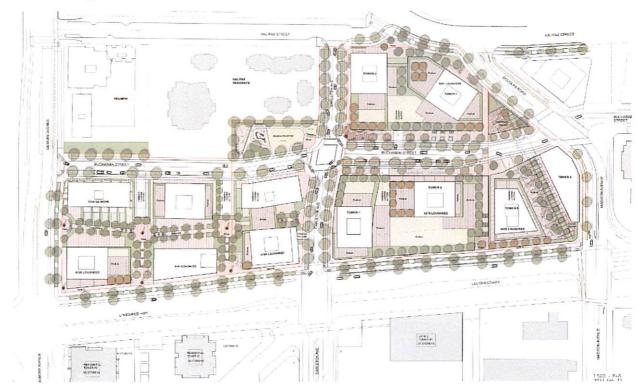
Conceptual site plan for the Buchanan West Master Plan Site
